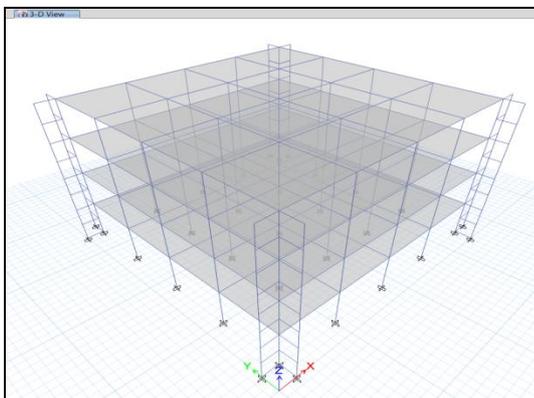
4 Storey RC Building with RC LCF (4RC_LCF)
